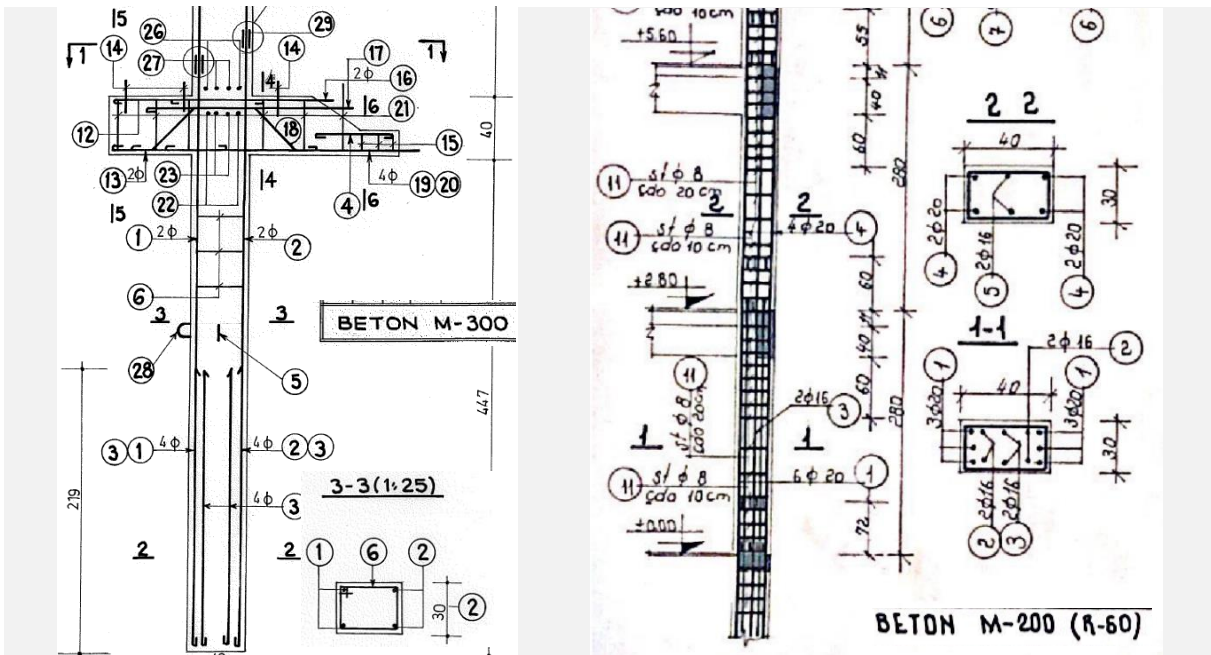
Column material and details: a-) Prefabricated RC Model 82/2: Concrete C25/30; Rebar 4Ø18 (less than 1%); Single hoop Ø6.5/20cm; b-) Cast-in-place RC Model 82/2: Concrete C16/20; Rebar 6Ø20+4 Ø16 (2.2%); Single hoop Ø8/10/20cm
